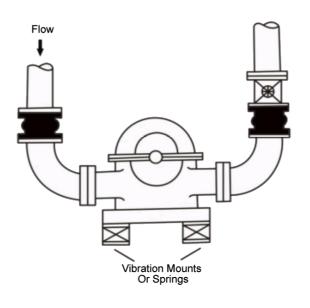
Typical Pump Installation With SunnySteel Expansion Joints Utilizing Vibration Mounts.
